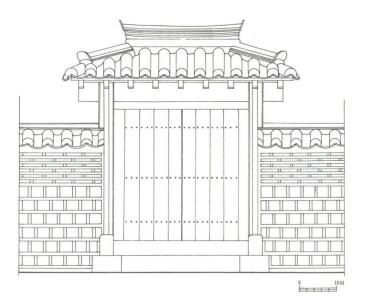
Side Gate Elevation (N. Zu 2003)
